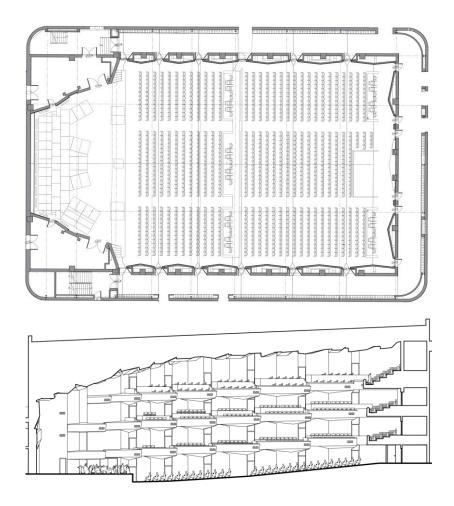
Stage level plans and long section of Orchestra Hall. The auditorium is surrounded by a corridor on the north, east and south sides. (courtesy of KPMB architects)
